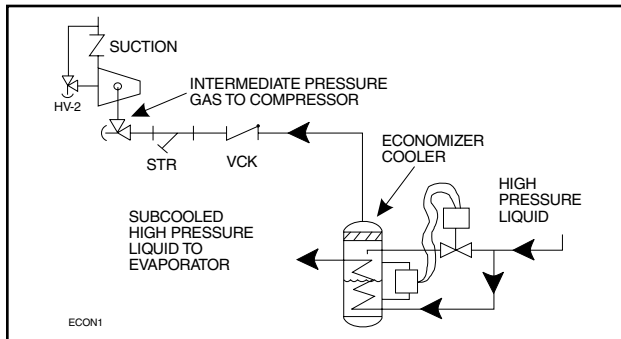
SHELL and COIL ECONOMIZER SYSTEM
